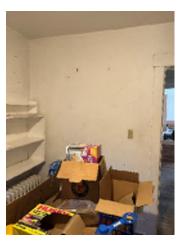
Wall Cracks Extending Diagonally Across the Entire Wall.
